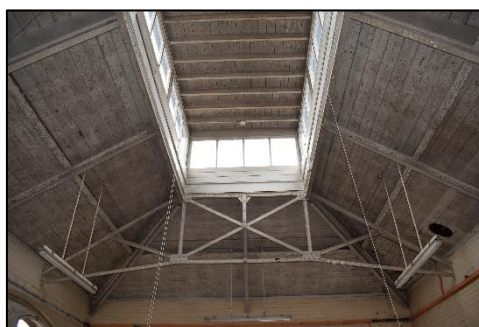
Original metal roof structure in the former officers laundry department, in a northern side room
